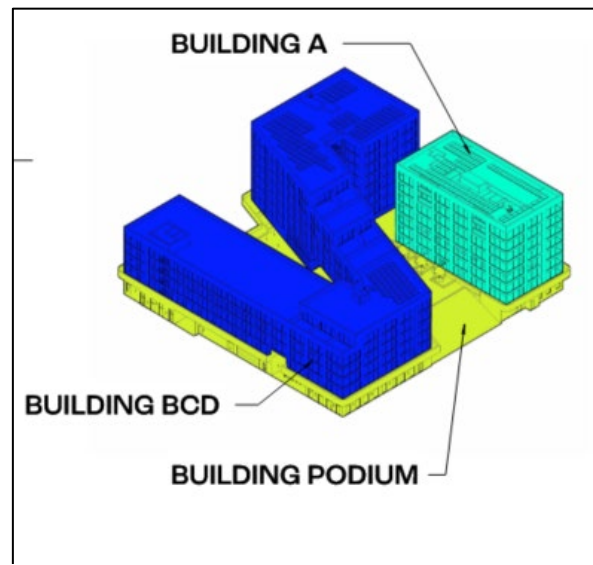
South Town Podium and Building Tower Sketch (White & Henry corner at bottom, looking SW)
